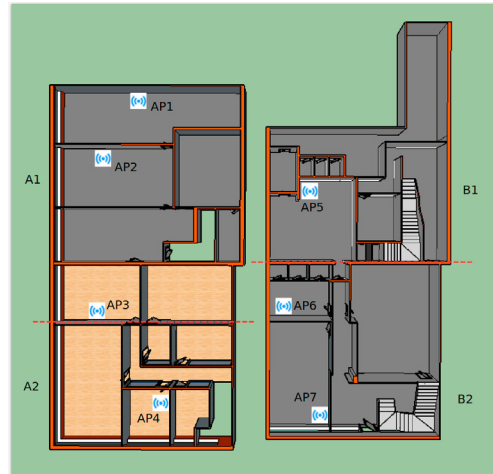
Floor plans of AngelPlus head office building. (Left) Second floor with zones A1 and A2. (Right) First floor with zones B1 and B2.
